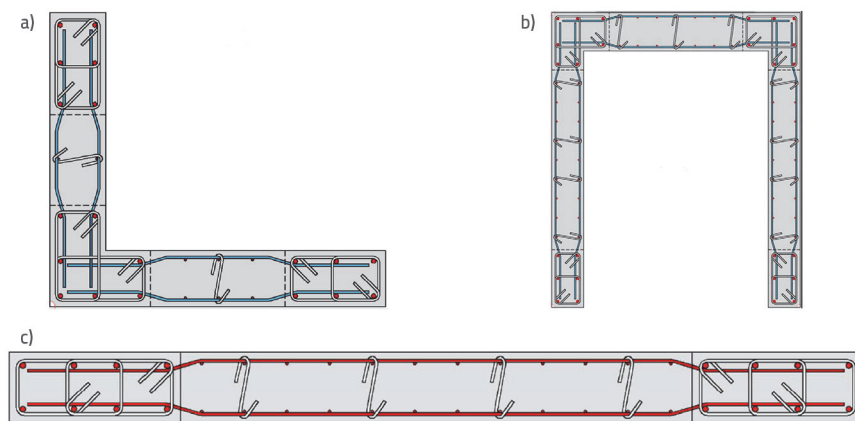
Reinforcement layout of a) "L"-shaped wall, b) "U", "C"-shaped wall, c) rectangular wall [9]
